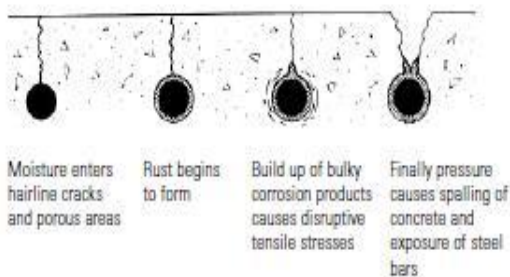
Show the phenomena of steel Reinforcement of MS Bar
